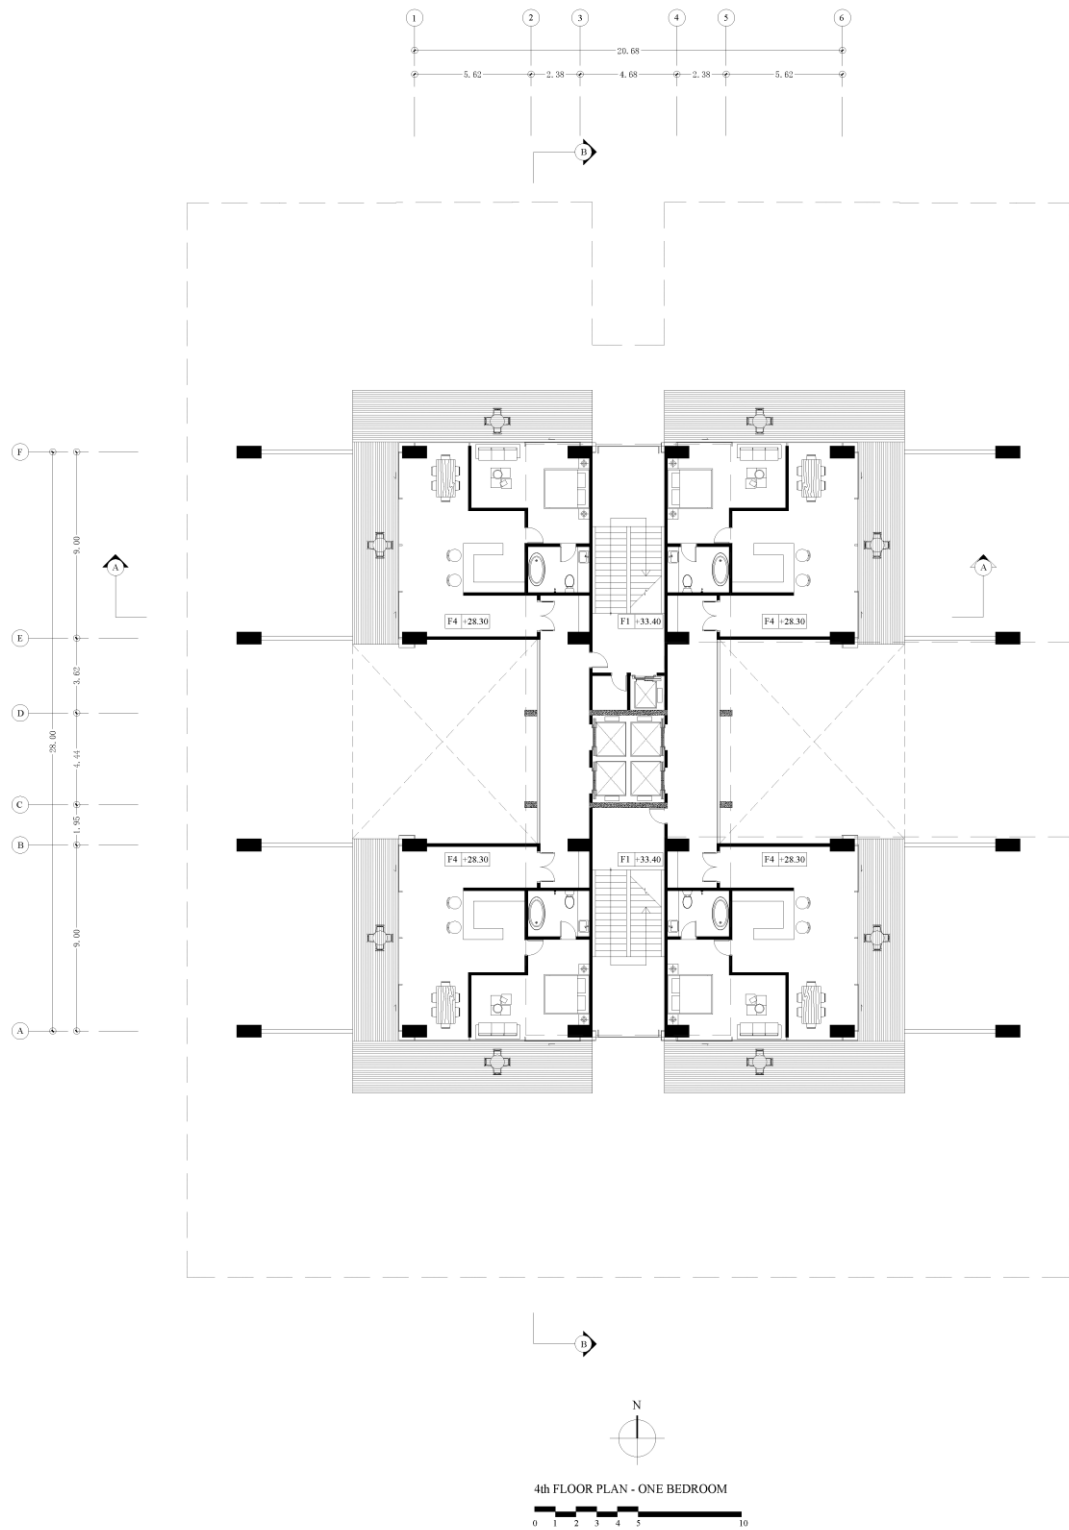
4th to 6th Floor Plan: One Bedroom Unit, drawn by the author.
